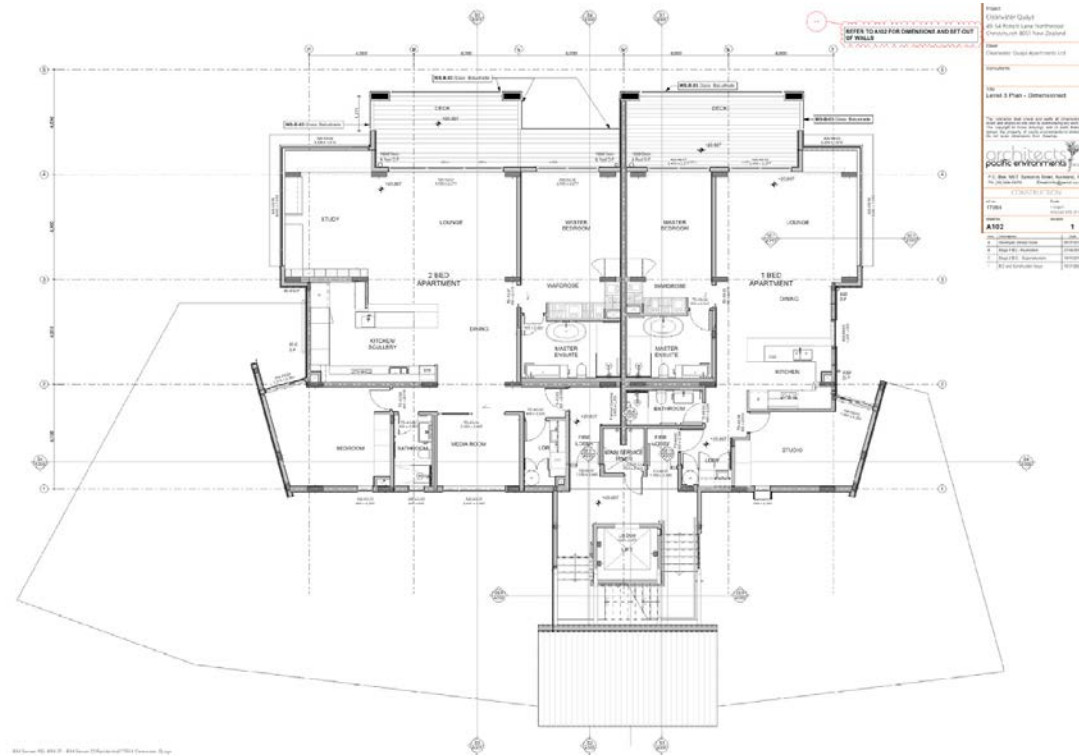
Typical layout of apartments (Levels 2 to 5)
